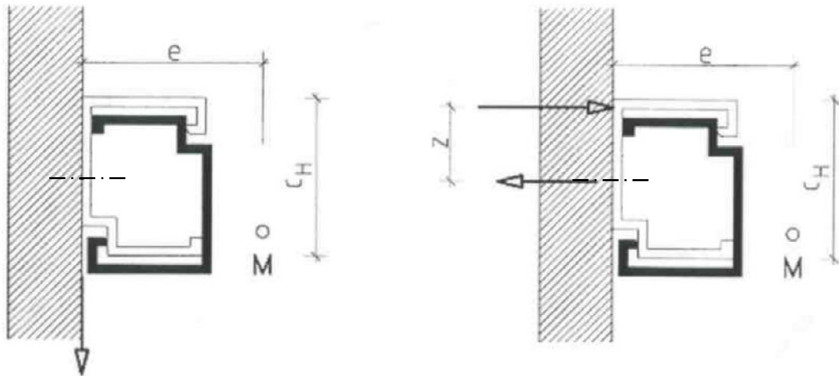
torsion of horizontal load-bearing profiles resulting from dead load of the façade panels
